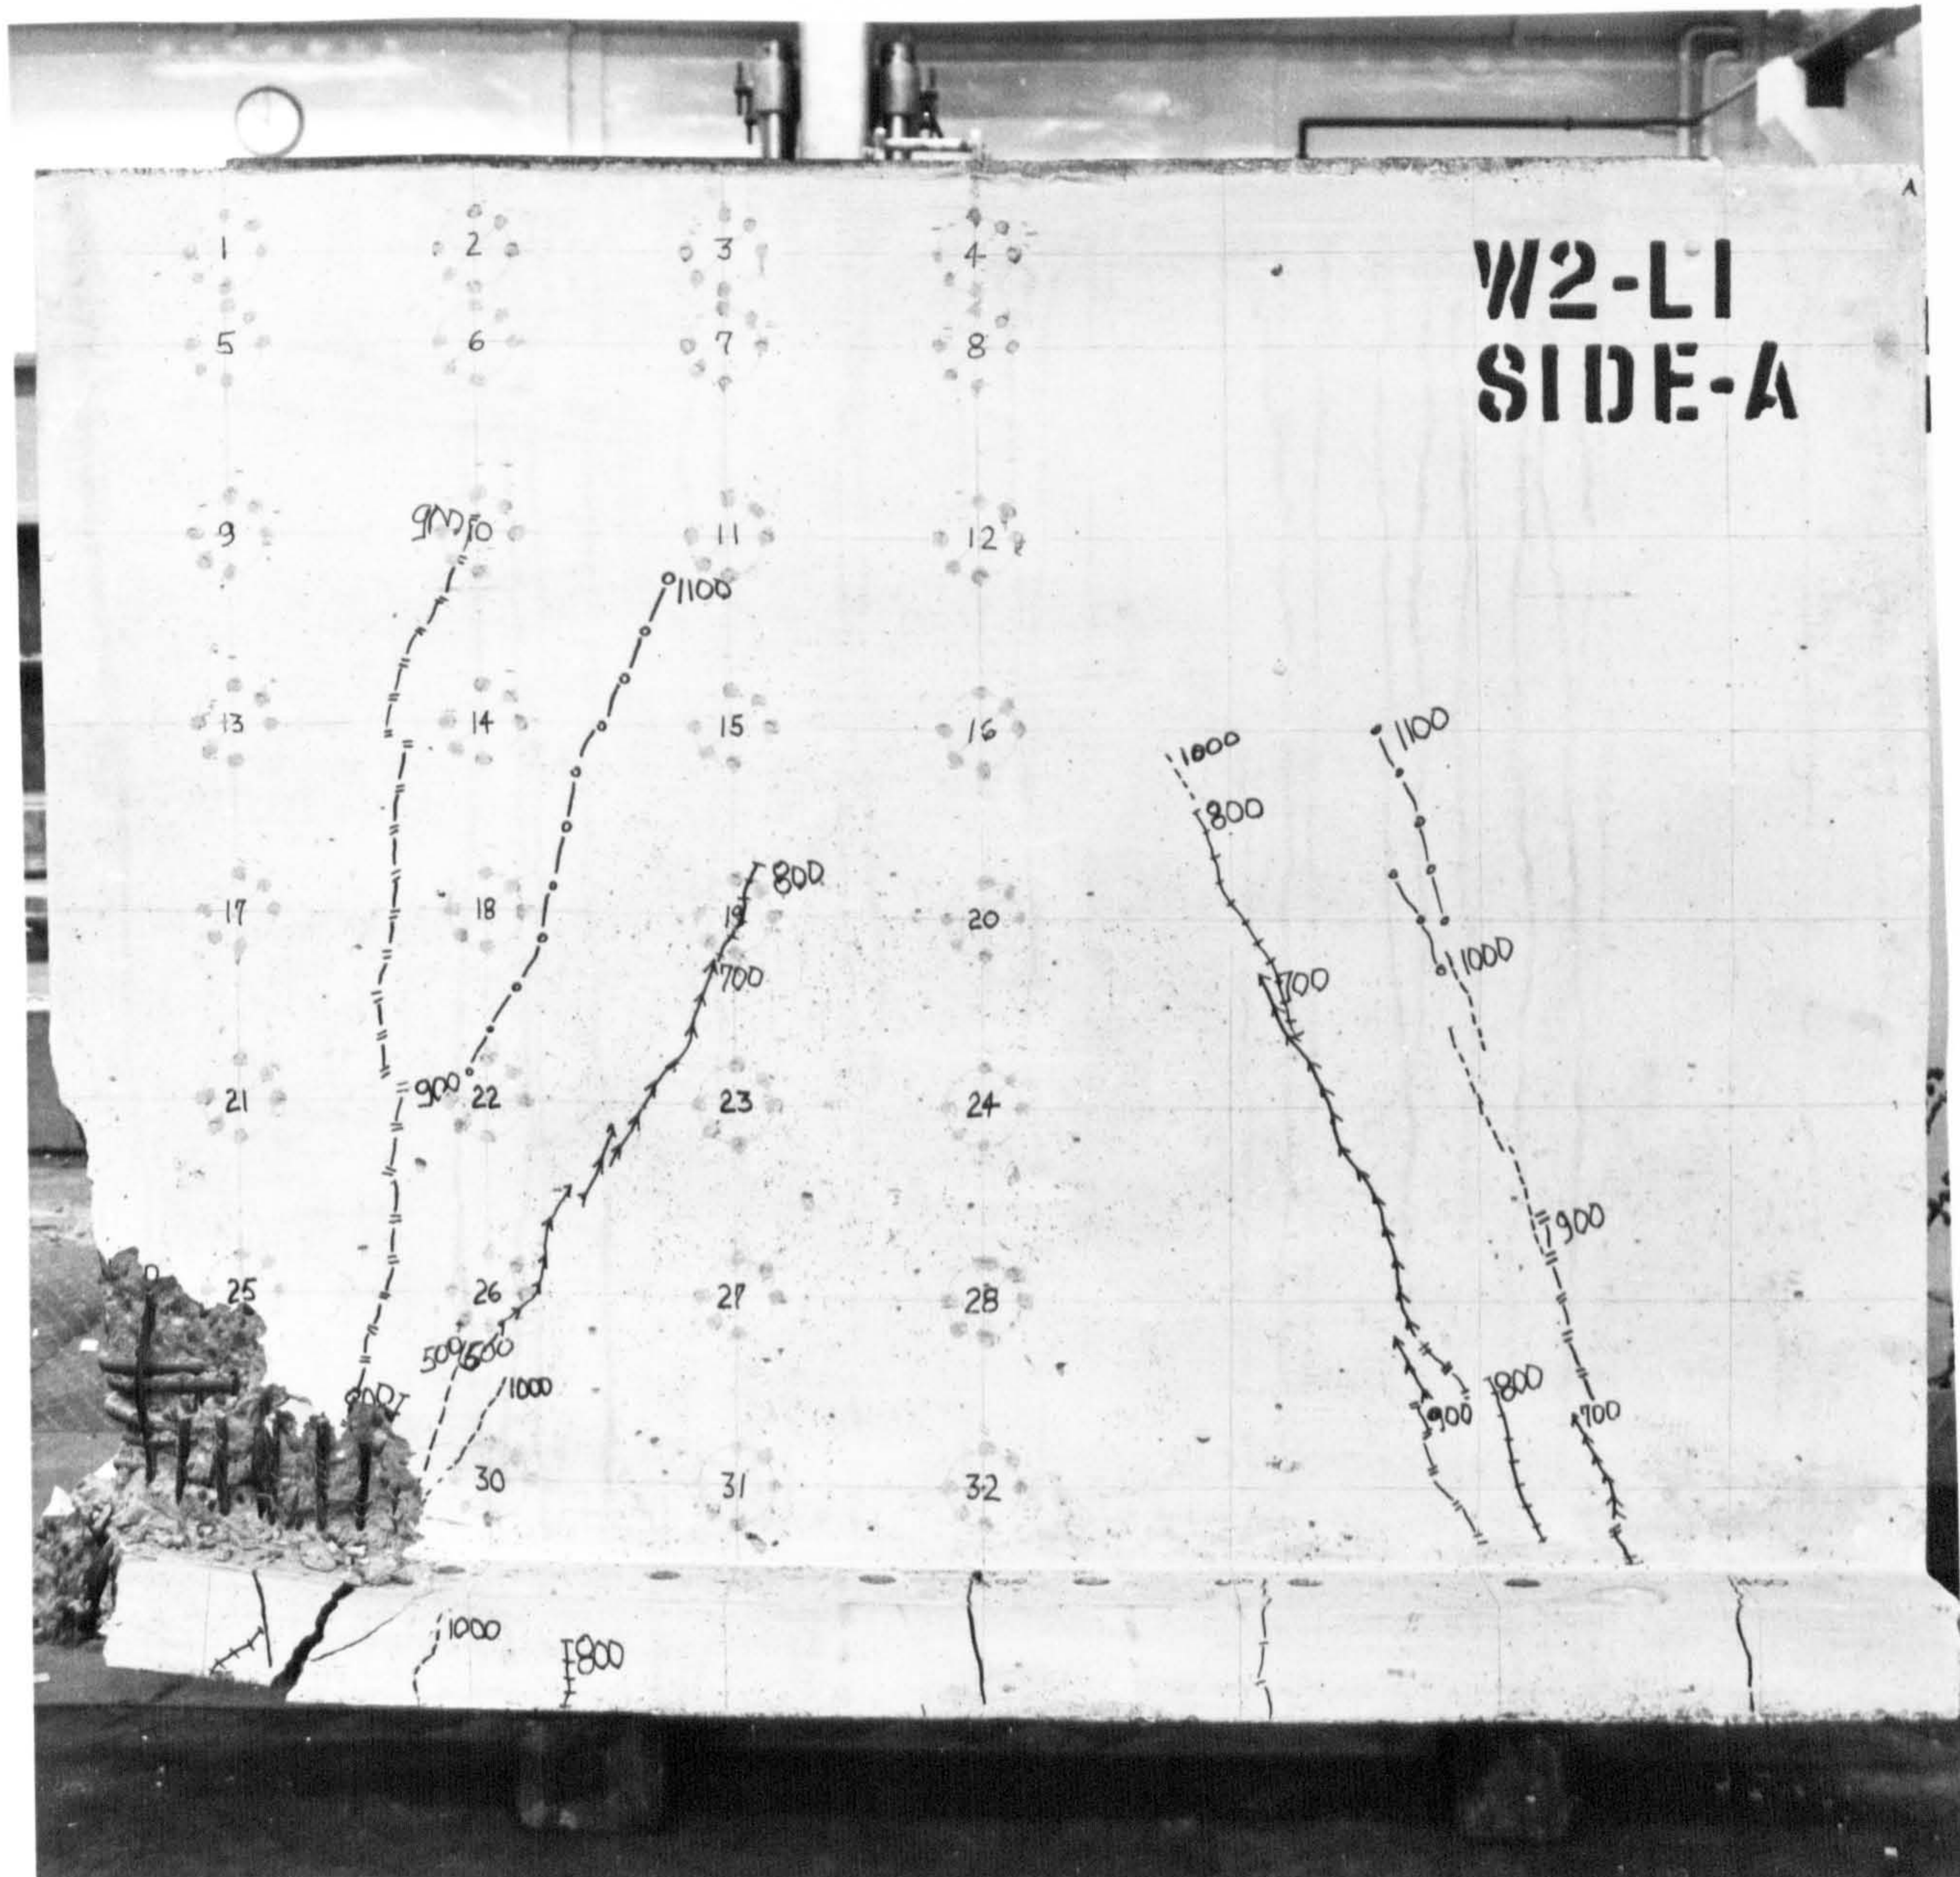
Final crack pattern at failure for specimen W2-L1
